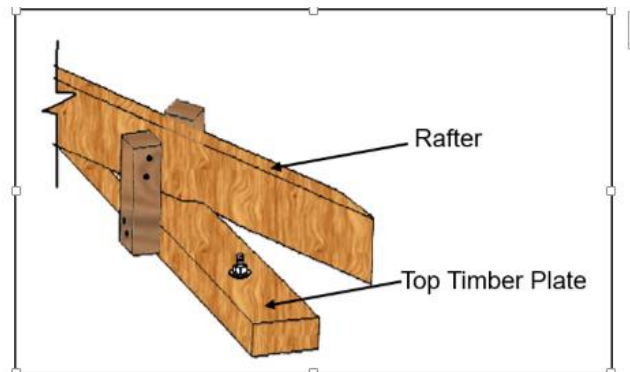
(A) ROOF FRAMING CONNECTION TO TIMBER WALLS BY USING MS STRAP
